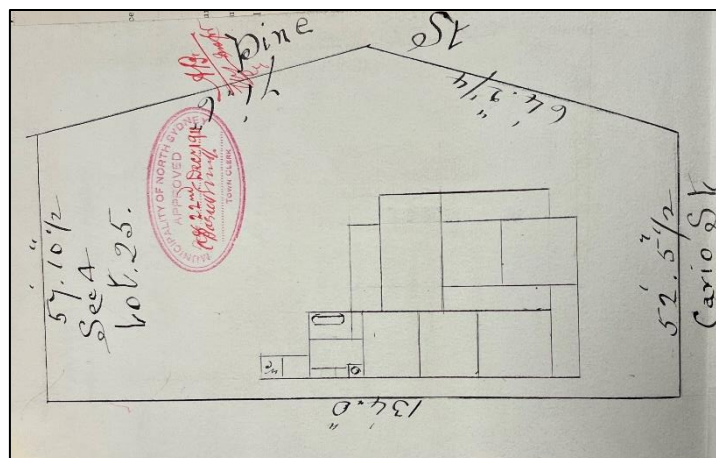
Block plan of No. 80 Cairo Street, as originally approved by Council on 22 December 1911.
